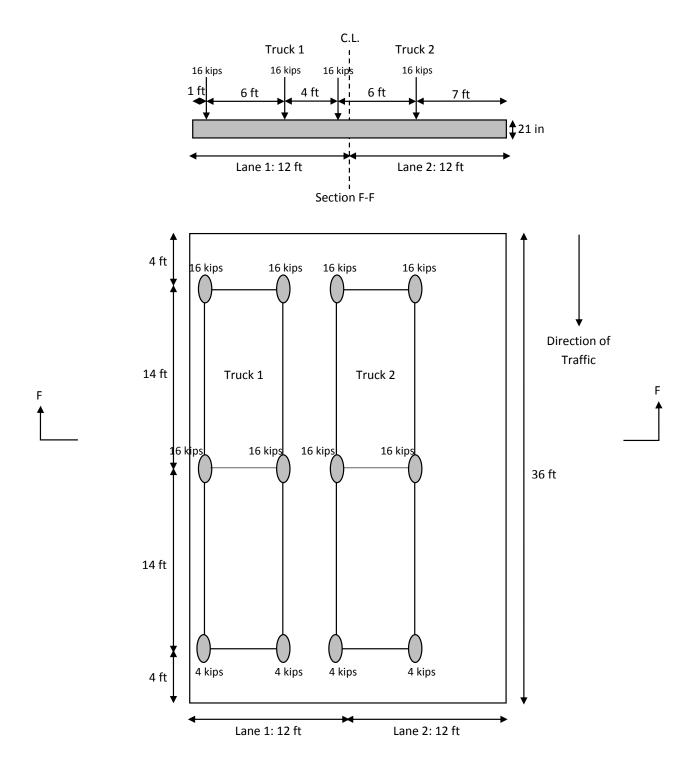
Typical Cross-Section and Plan of a Two-Lane 36 ft Span Straight Bridge with No Railings under Edge Loading E1.
